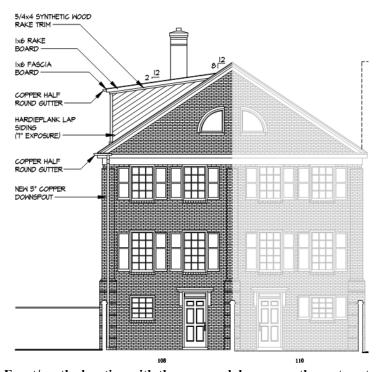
Front/north elevation with the proposed dormer on the eastern townhouse
